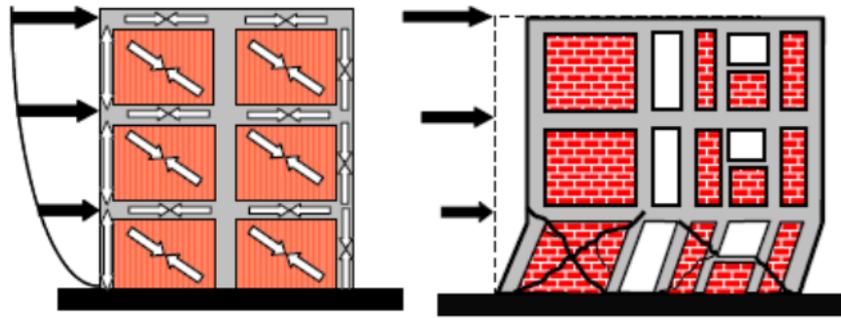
Soft storey mechanism for multi-storey confined masonry building.
